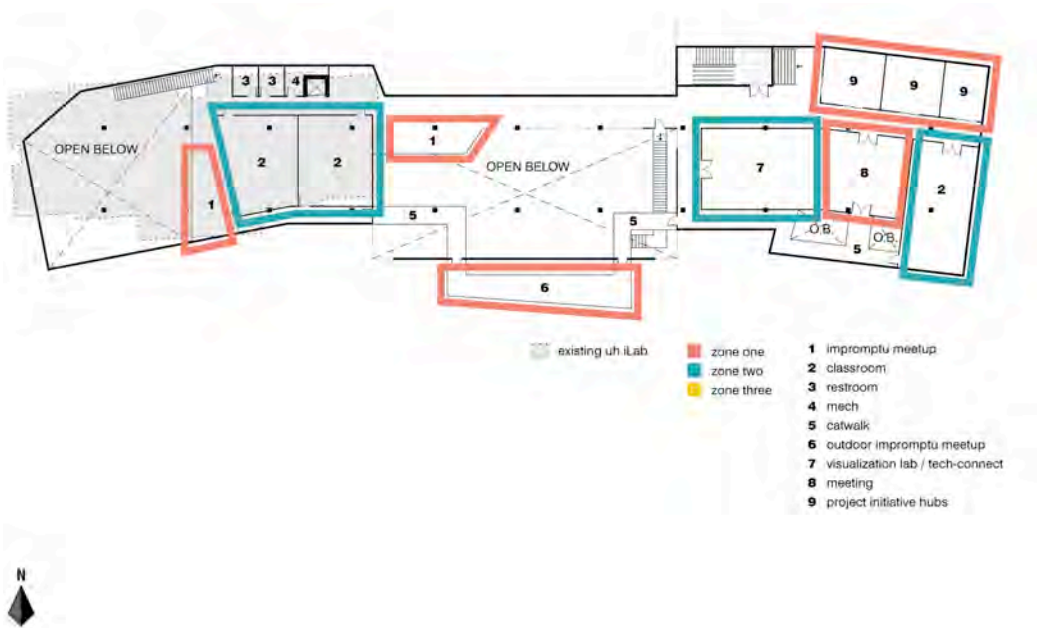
Progressionally informed composition: UH co.Lab second floor plan
